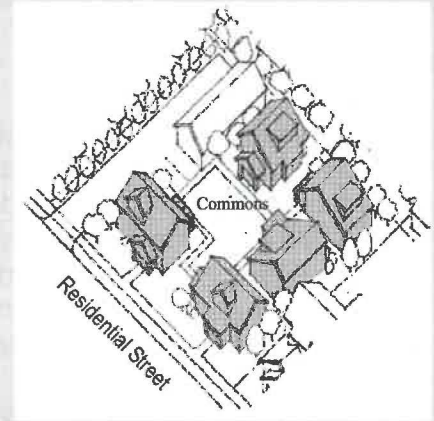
Cottage housing example. Note arrangement with central commons, connecting walkways, porches orienting to street and commons, varied roof forms, and parking off to the side.
